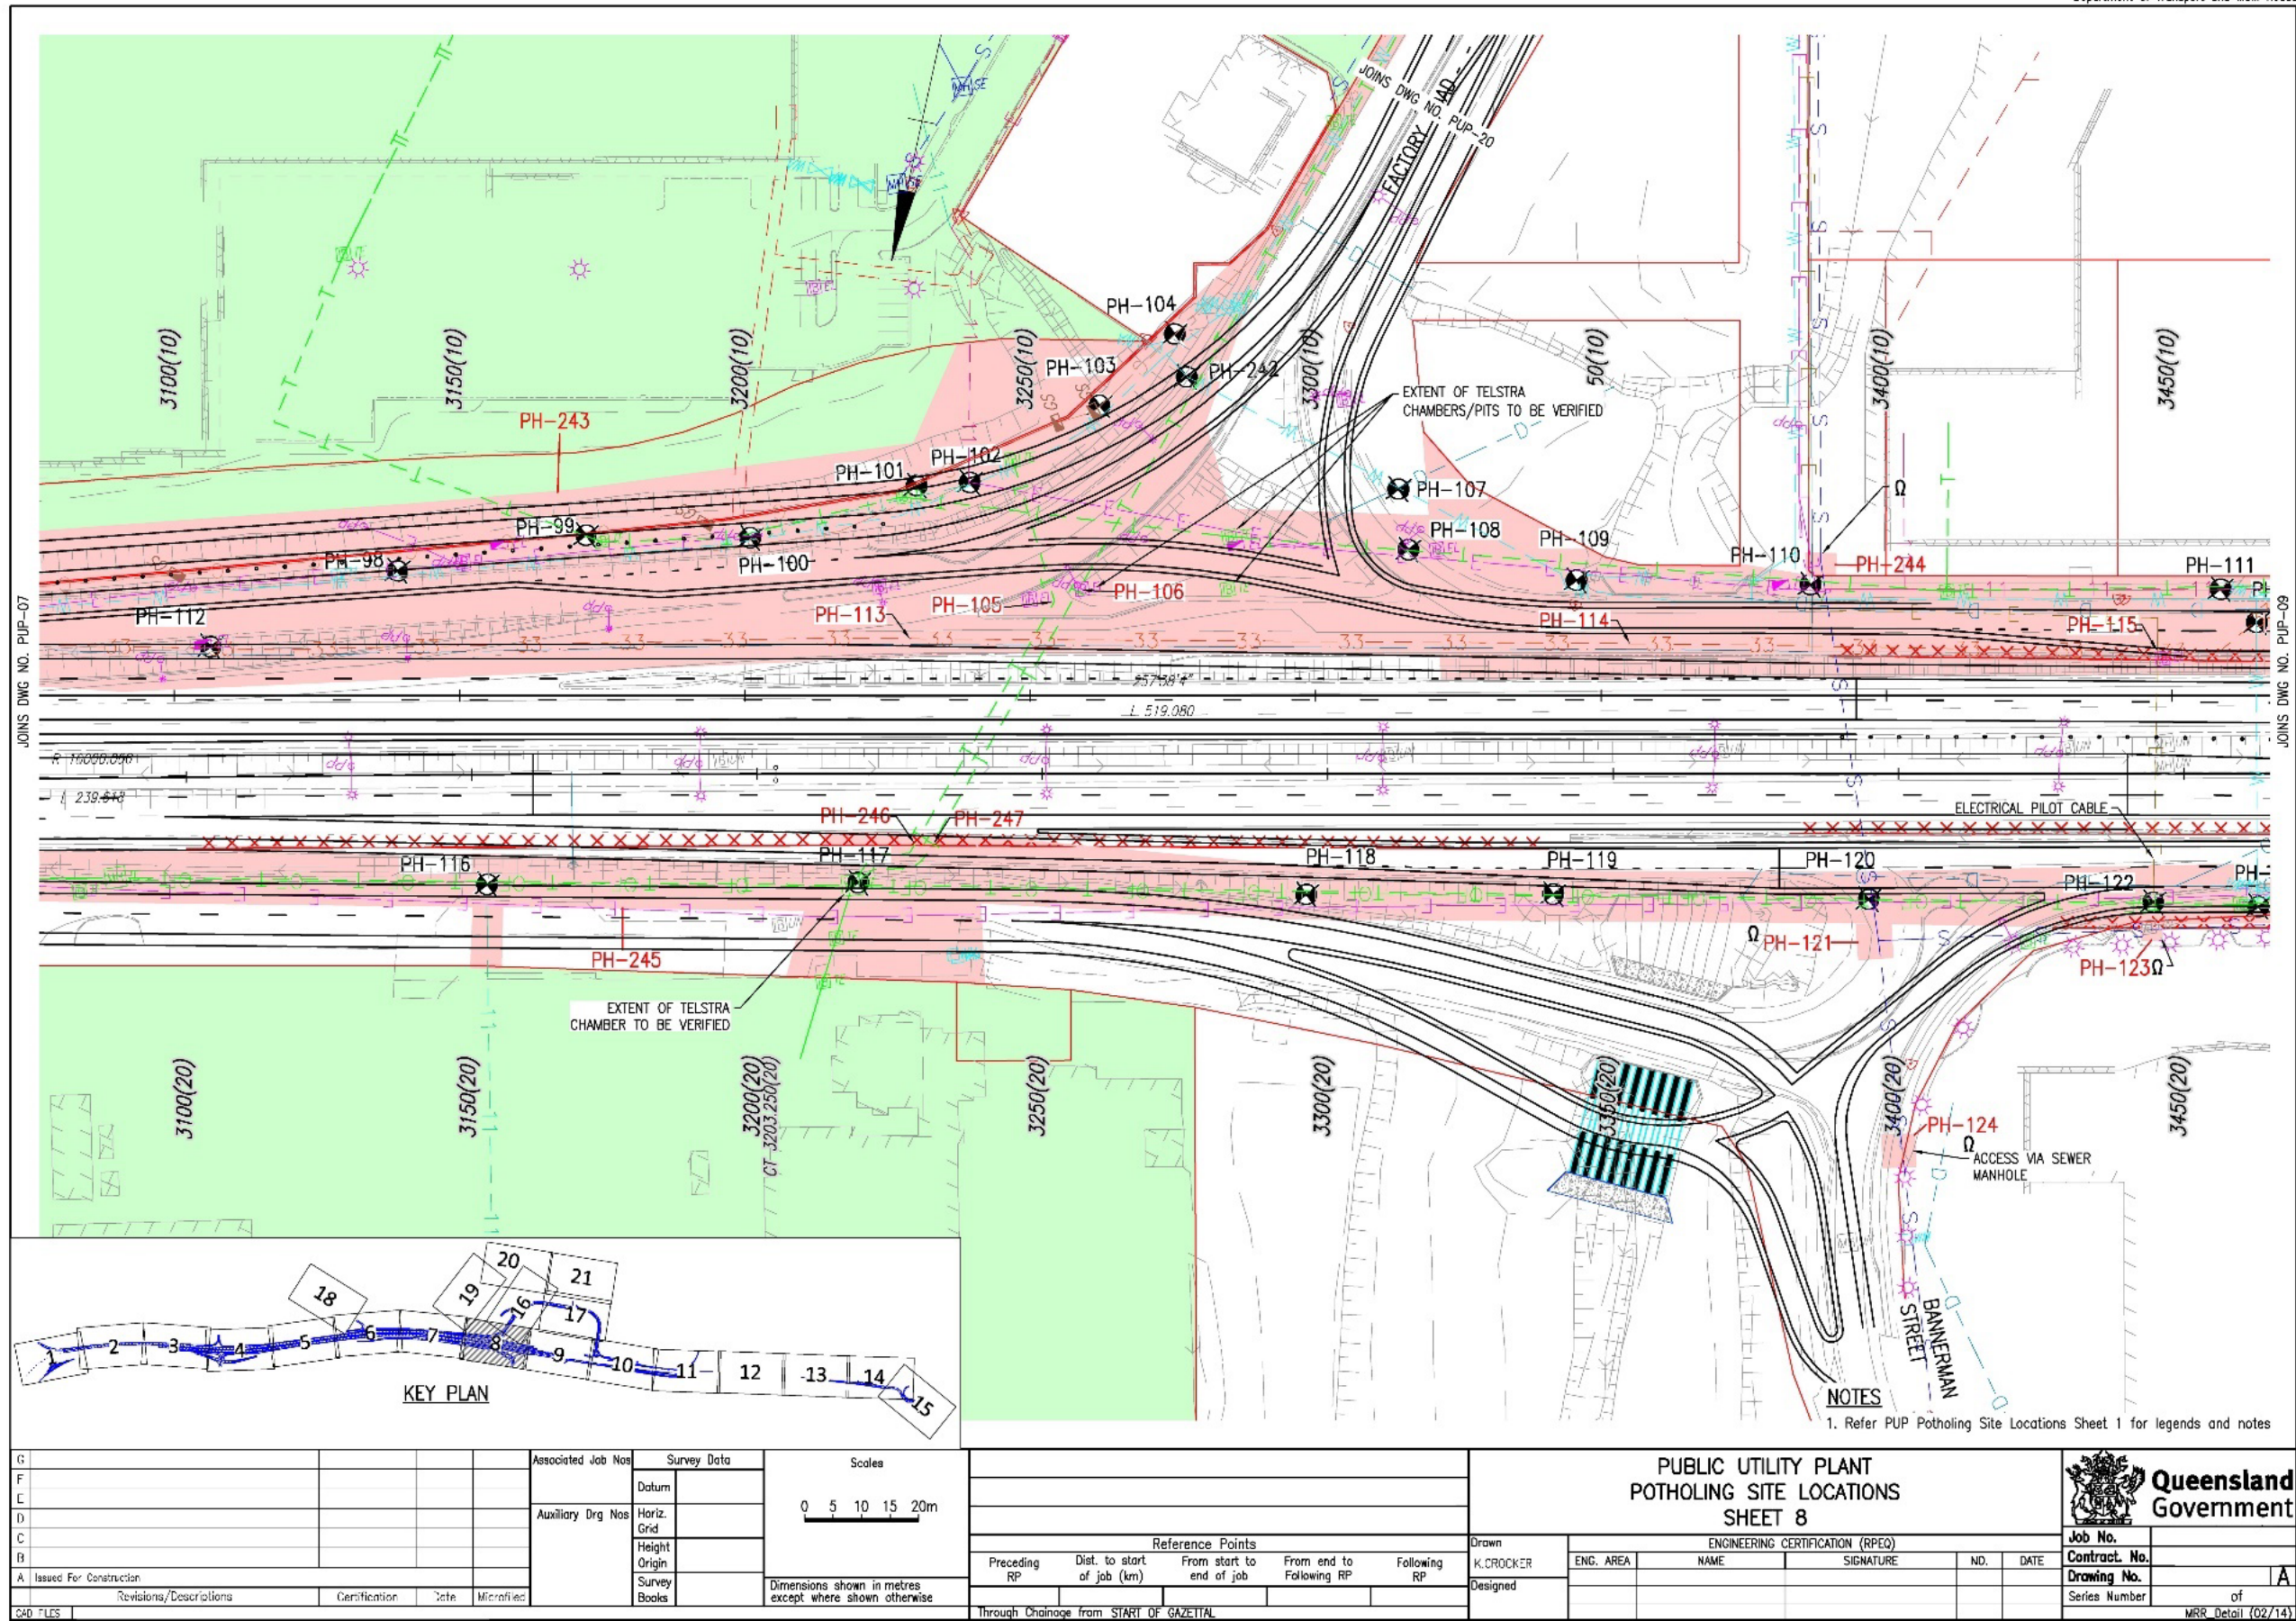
(c) – PUP Potholing and Field Investigation Plans generic example – Sheet 1 of 4
